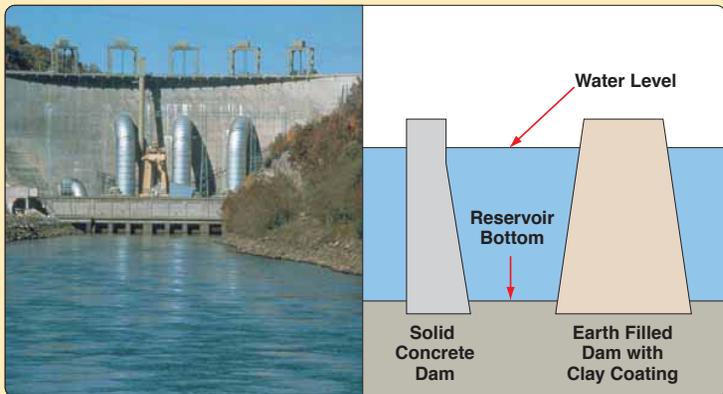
The drawing shows two common types of dams. The photo shows a gravity dam. (American Electric Power Co.)
